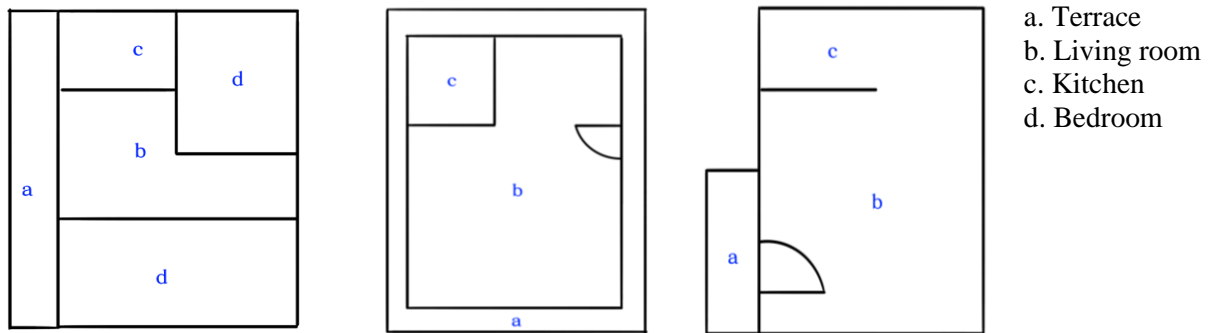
The diverse layout of the *Lanting House* Floor Plan
